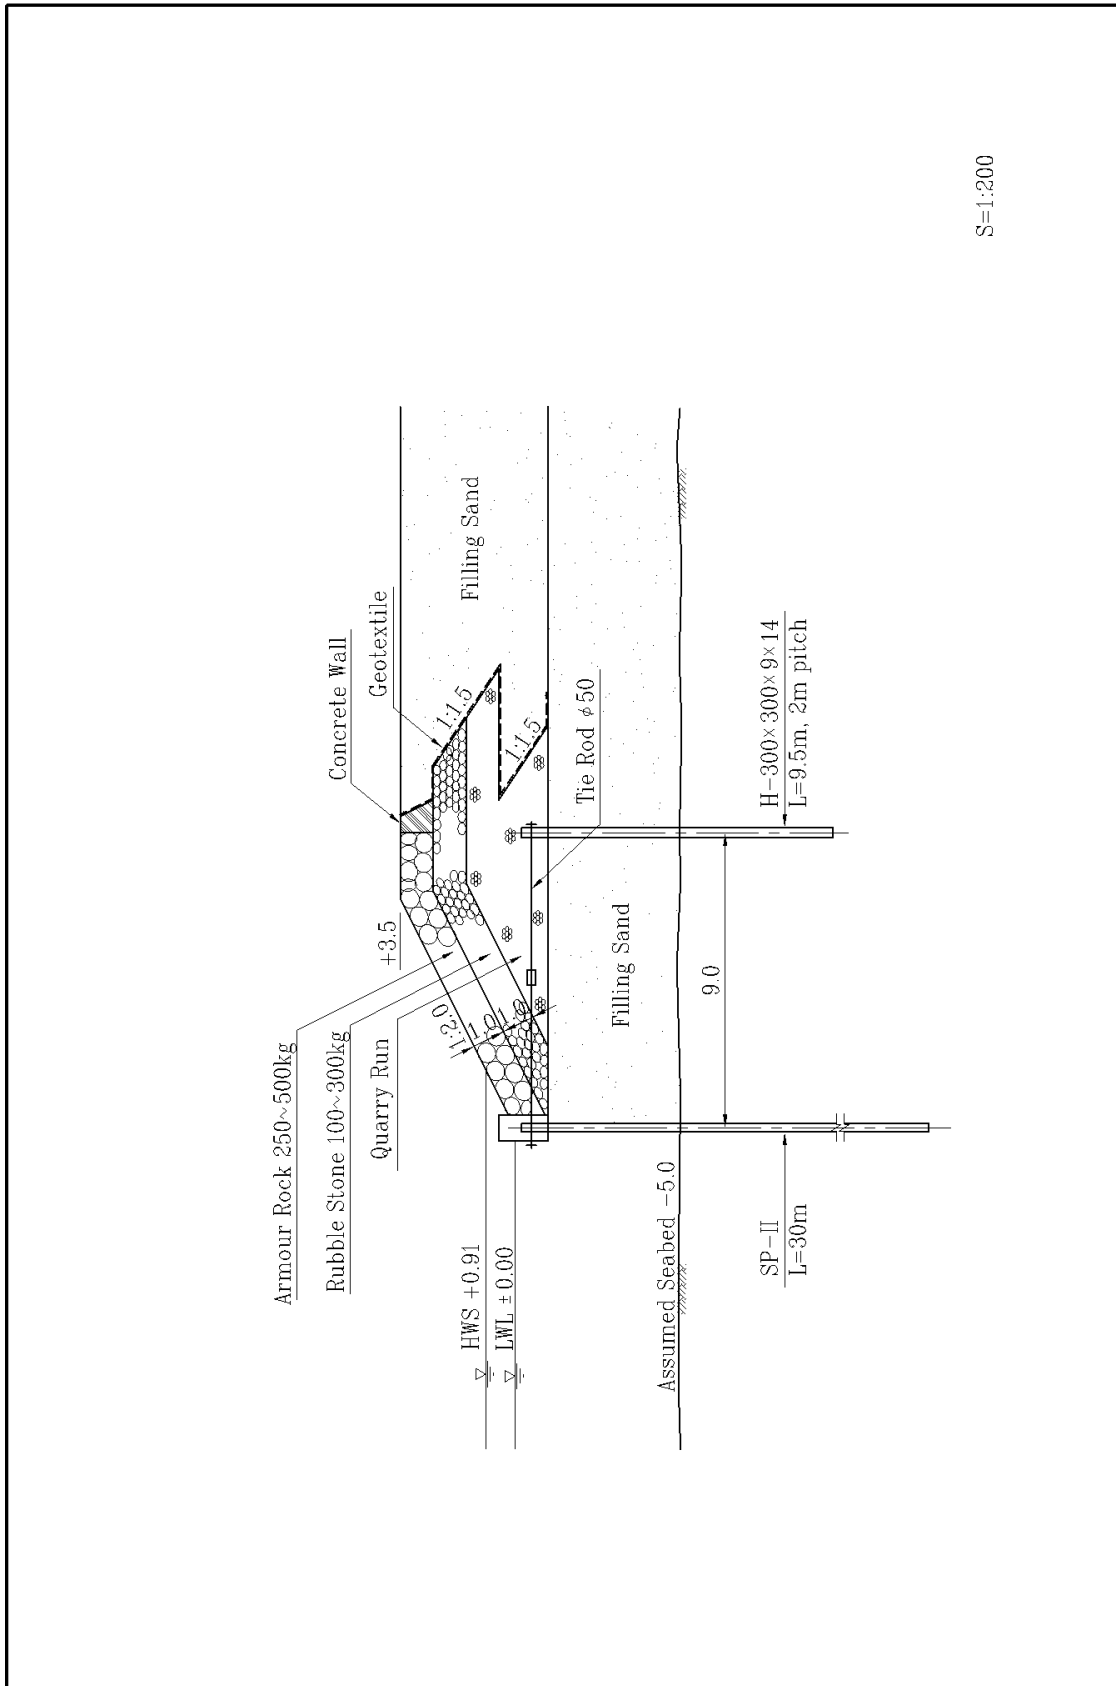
F-11 Typical Section of Revetment of Reclamation at Tanjung Priok
